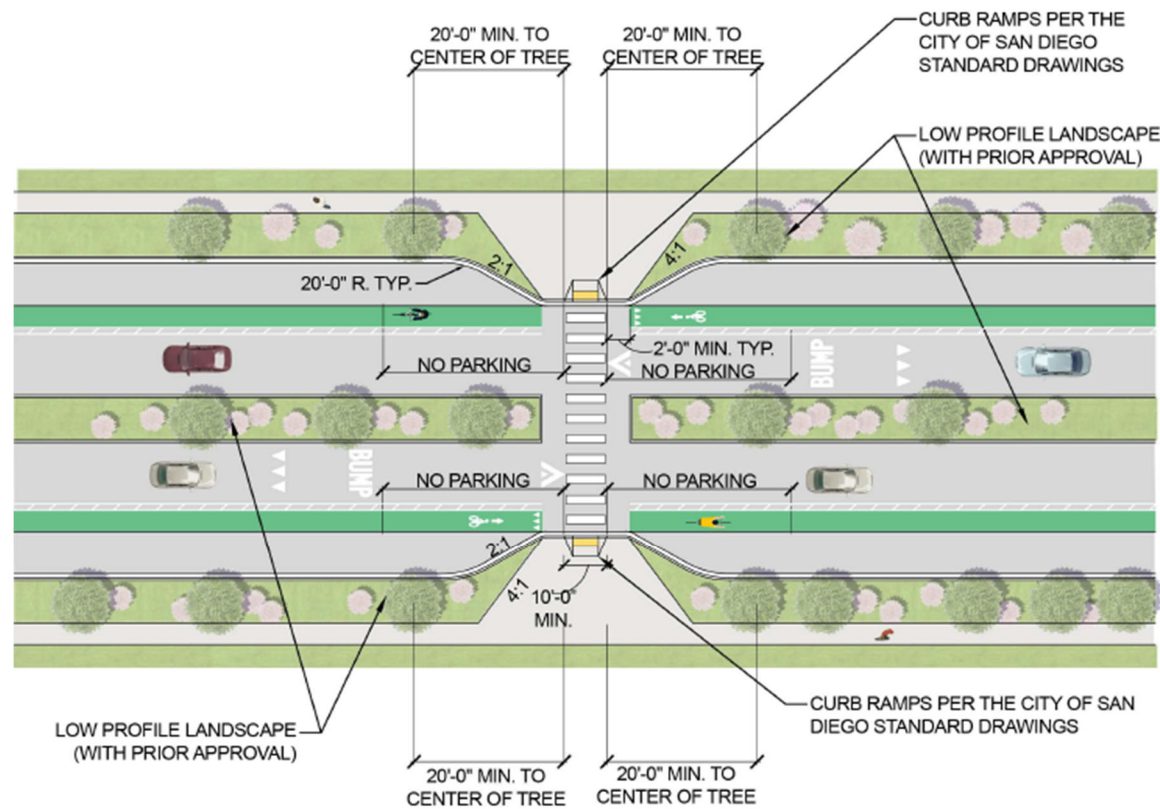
MID-BLOCK CROSSING PLAN VIEW
